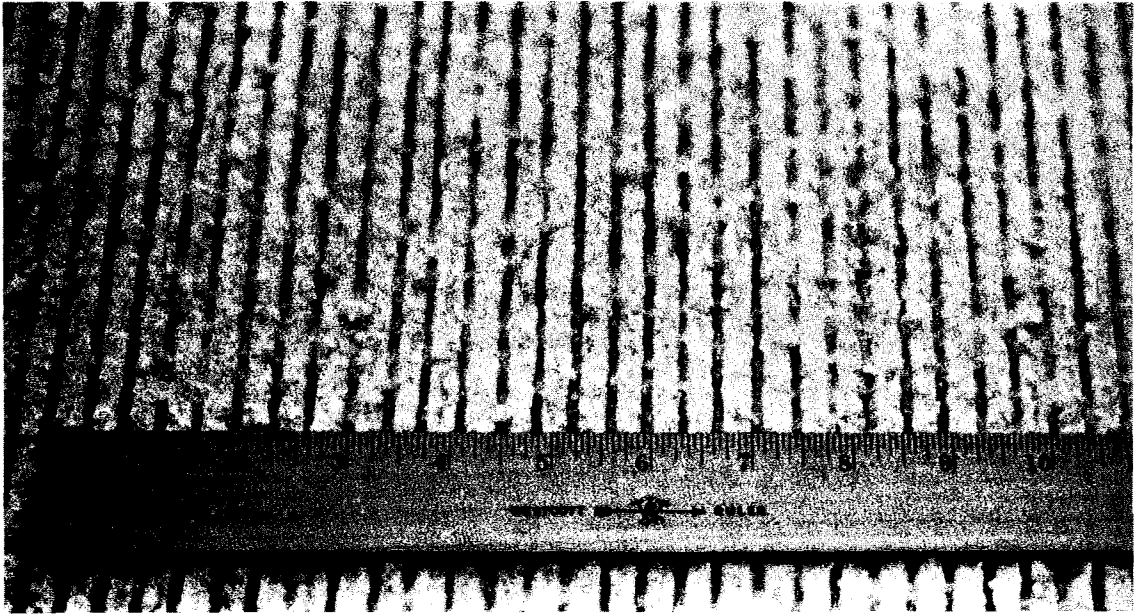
Test Section F-15: 1/4 in. Longitudinal
